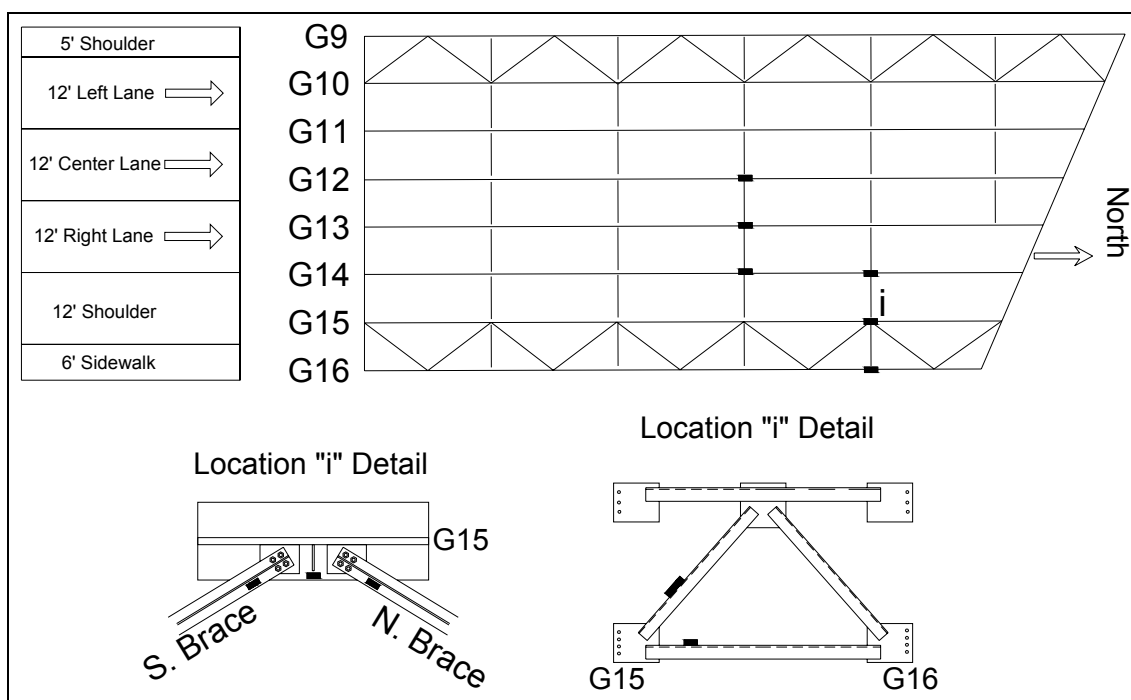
Route 23 over Route 202 Span 2 instrumentation plan.
